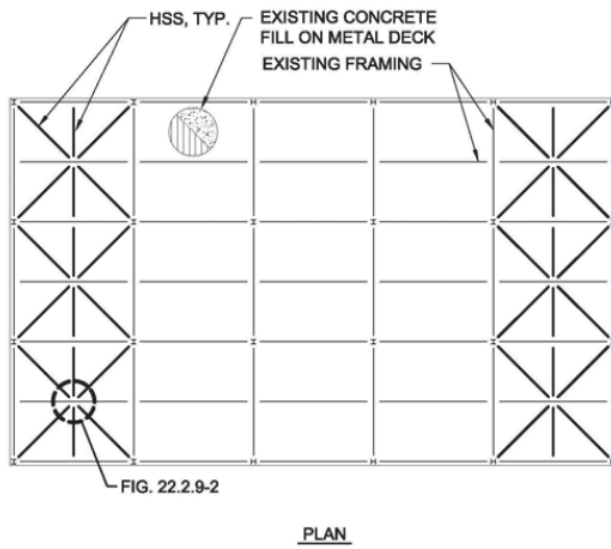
Diaphragm Strengthening using Horizontal Braced Frame
